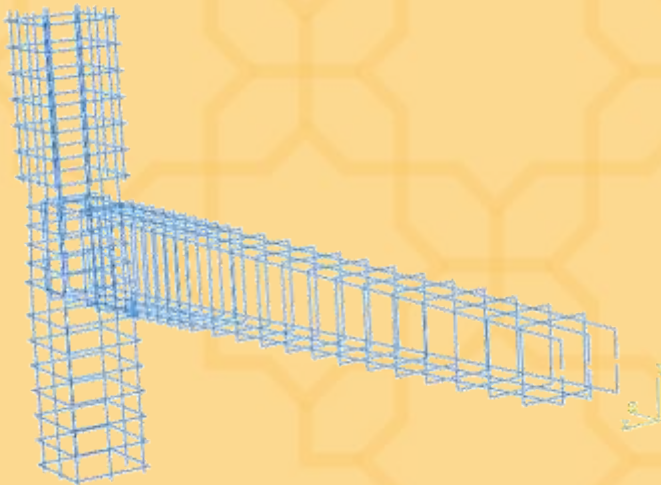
Detail of Cantilever beam sample 2 (BK-2)
